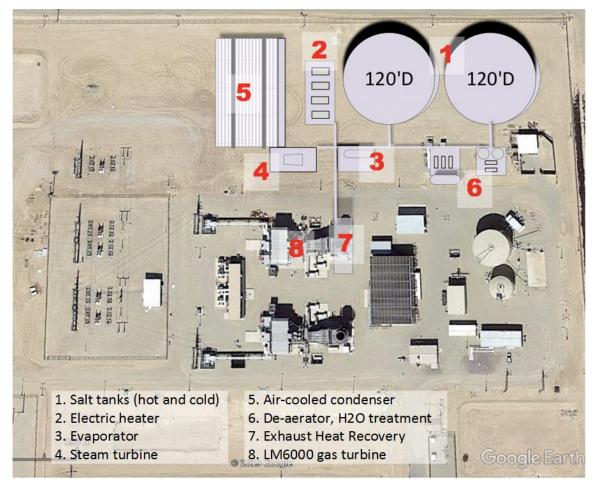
Conceptual general arrangement showing the upgrade of one out of two units at an existing peaking plant.
